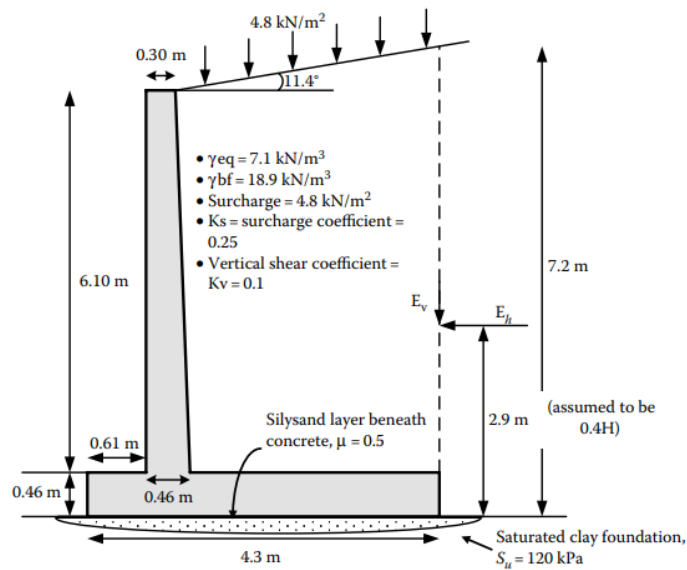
Section of analyzed cantilever retaining wall with silty sand backfill
